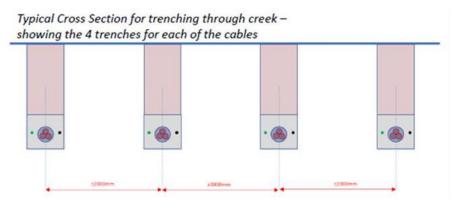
Trench Cross Section Specs (provided by Developments Biala)
